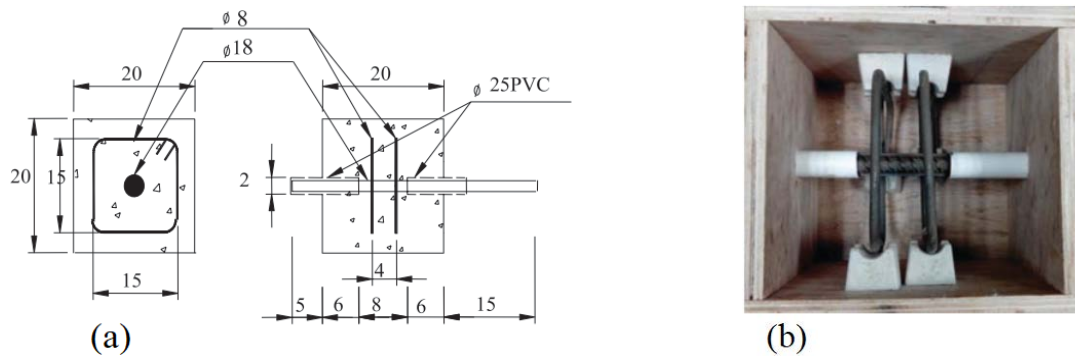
(a) Specimens geometry, (b) Formwork for specimen [20]
